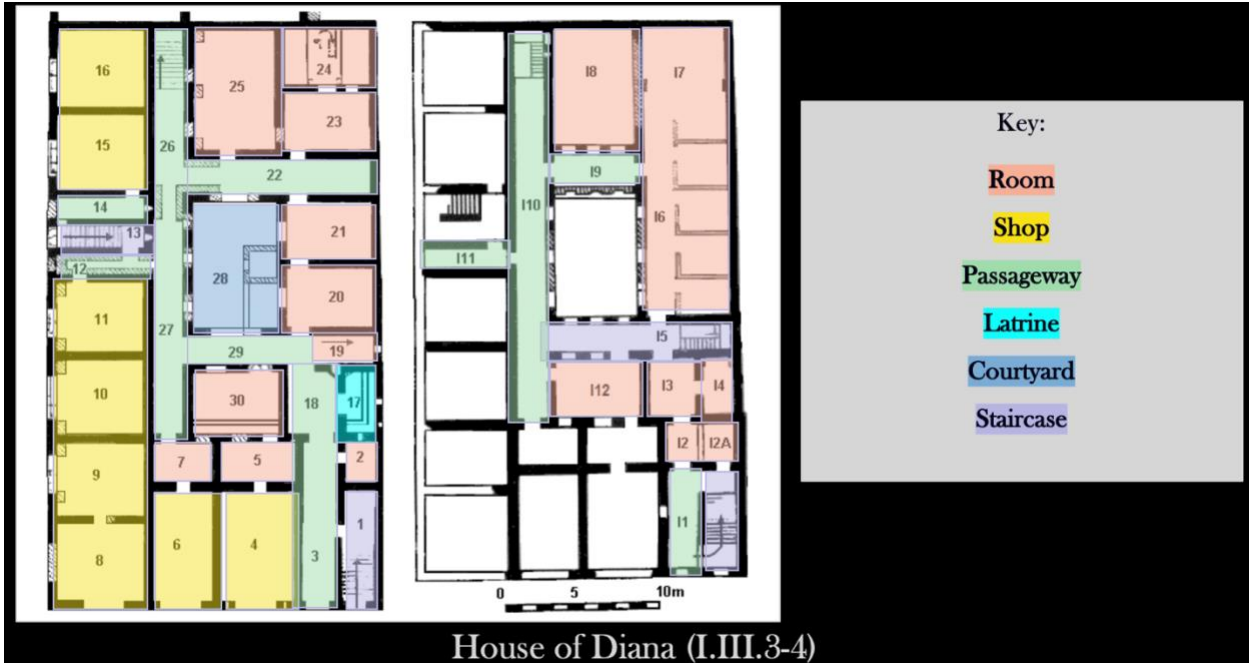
Floorplan of House of Diana with ground floor (L) and first floor (R). Each room with a known function has been color-coded according to the key above. The ground floor holds shops and various sizes of private apartment (the private apartments are called “Room” in the key). Note that the section of multi-occupancy rooms is marked 16 and the communal living room is marked 17.
